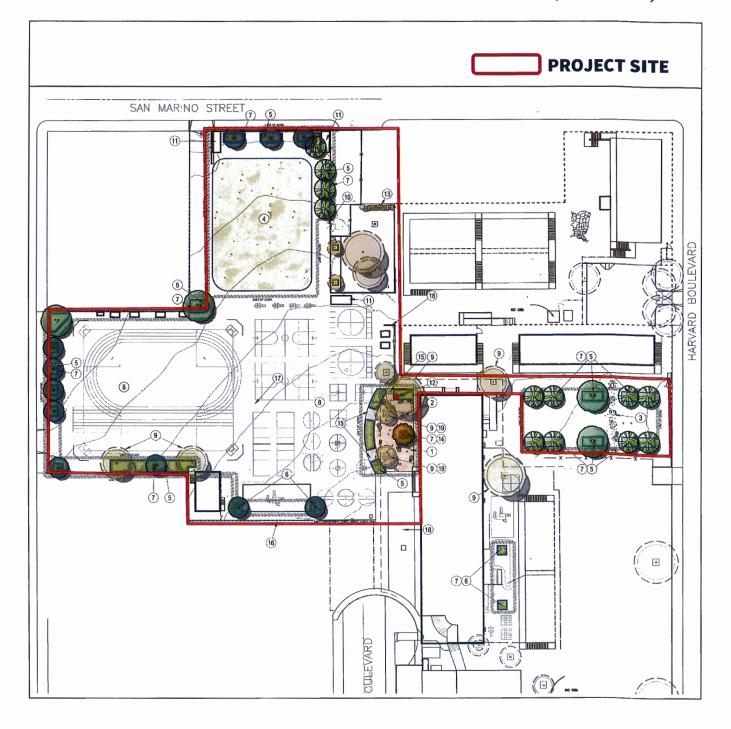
## EXHIBIT A - FORD BOULEVARD ES SITE PLAN (not to scale)
